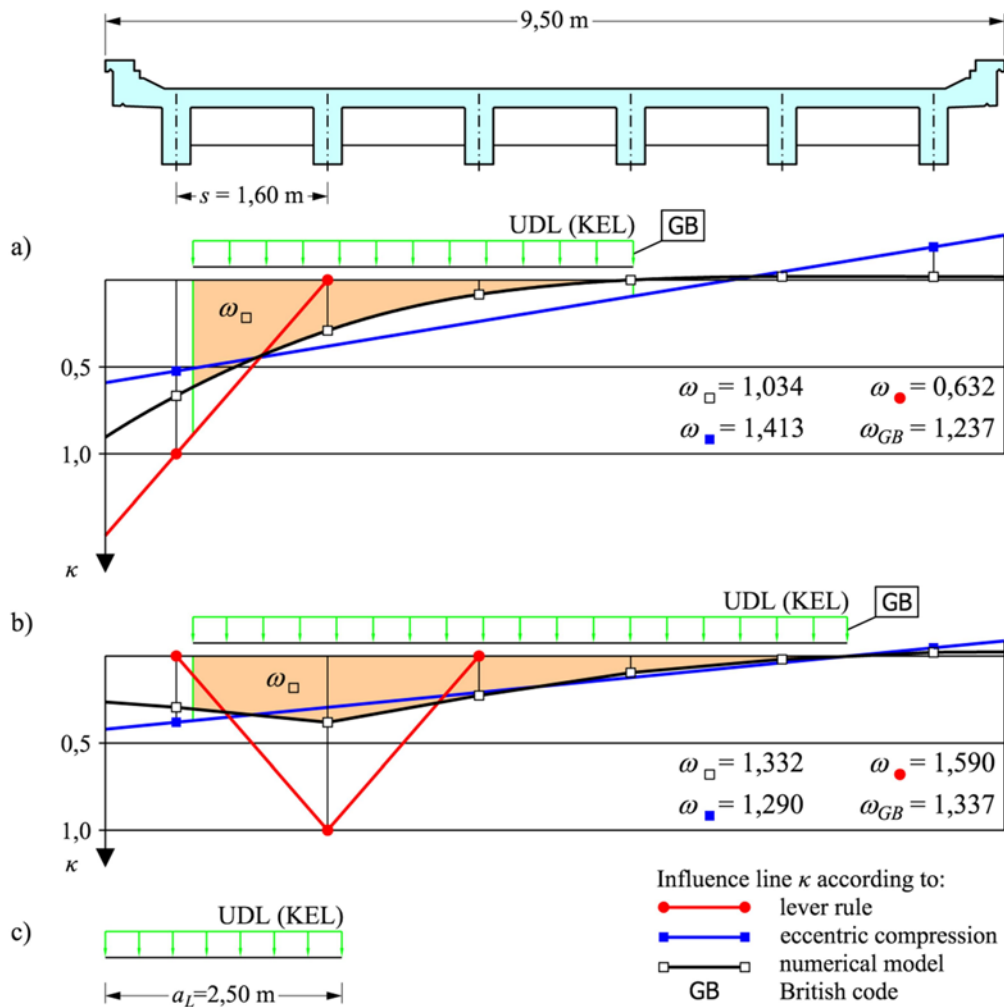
Load distribution in six-girder concrete bridge: a) external girder, b) internal girder, c) HA loading for assessment
